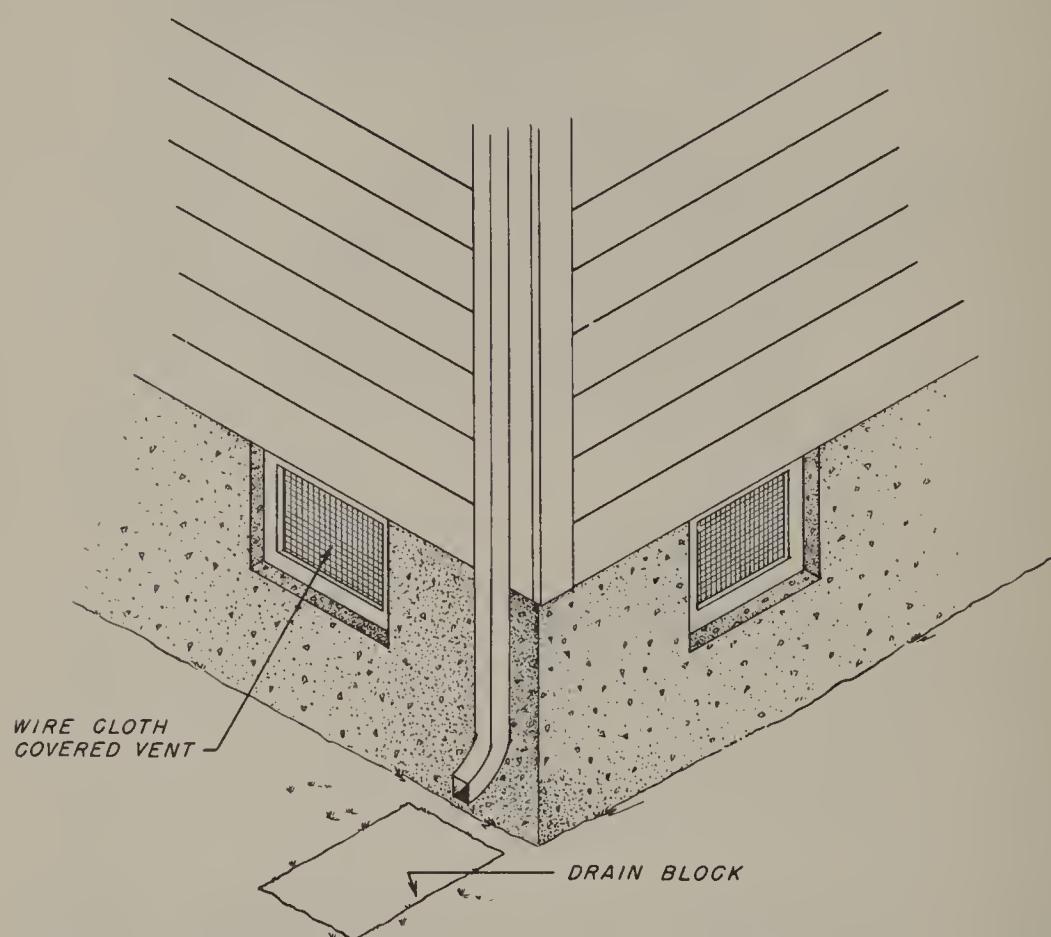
Basementless house, crawl-space ventilation.* Condensation control indicated in figure 12 is further illustrated by screened ventilators in the foundation wall. Two vents are indicated but in small houses one vent per corner would probably meet the requirements in a satisfactory way. A splash block and a gentle slope away from the building will tend to minimize the possibility of water getting under the building. The use of an underground drain would be preferable to surface drainage.
